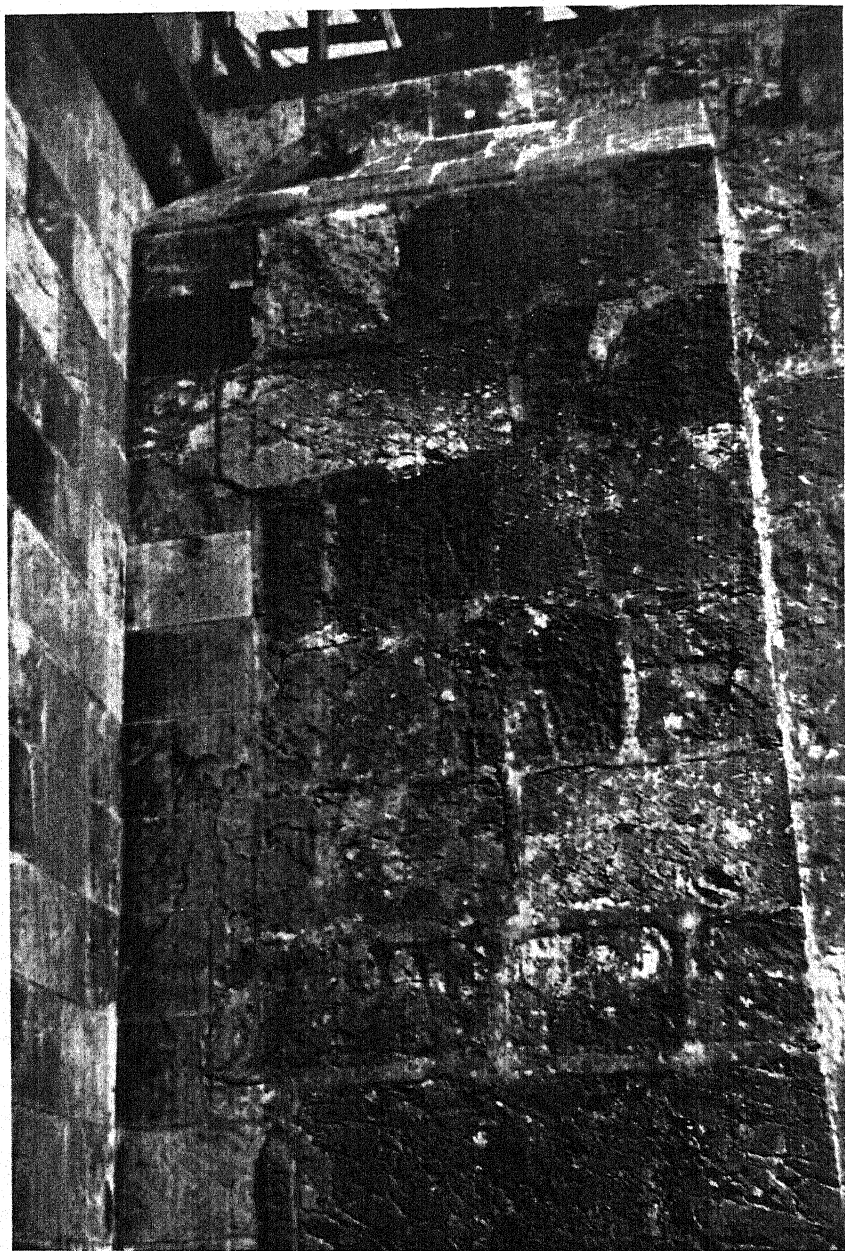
SOUTH TRANSEPT HIGH VAULT W. WALL
